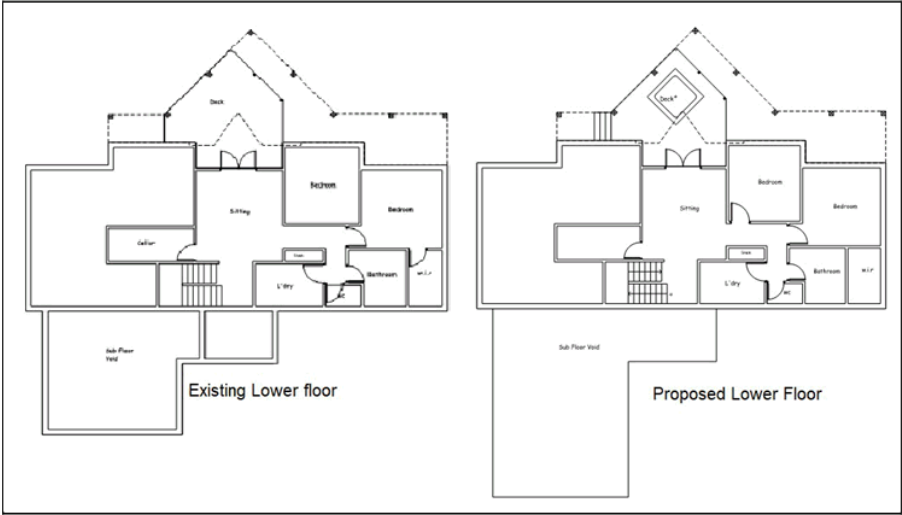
Existing and Proposed Lower Ground floor plan (DuoDesigns, 2020)
